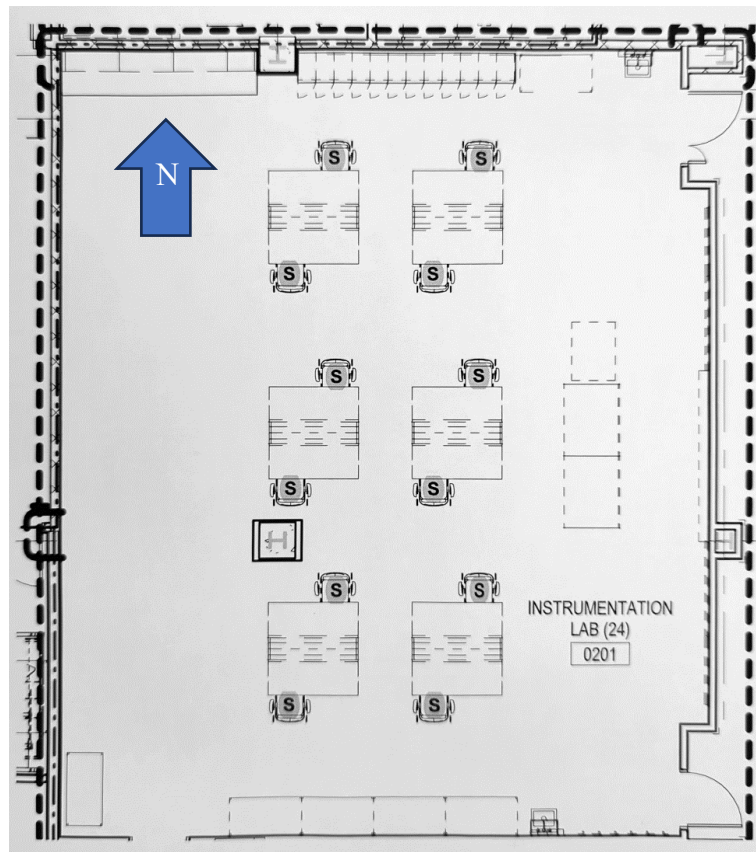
Floorplan of existing lab space during COVID. North is up.
